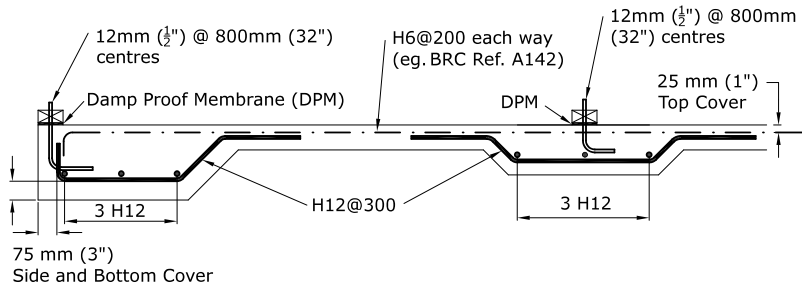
LAYOUT OF SLAB-ON-GROUND FOOTING
